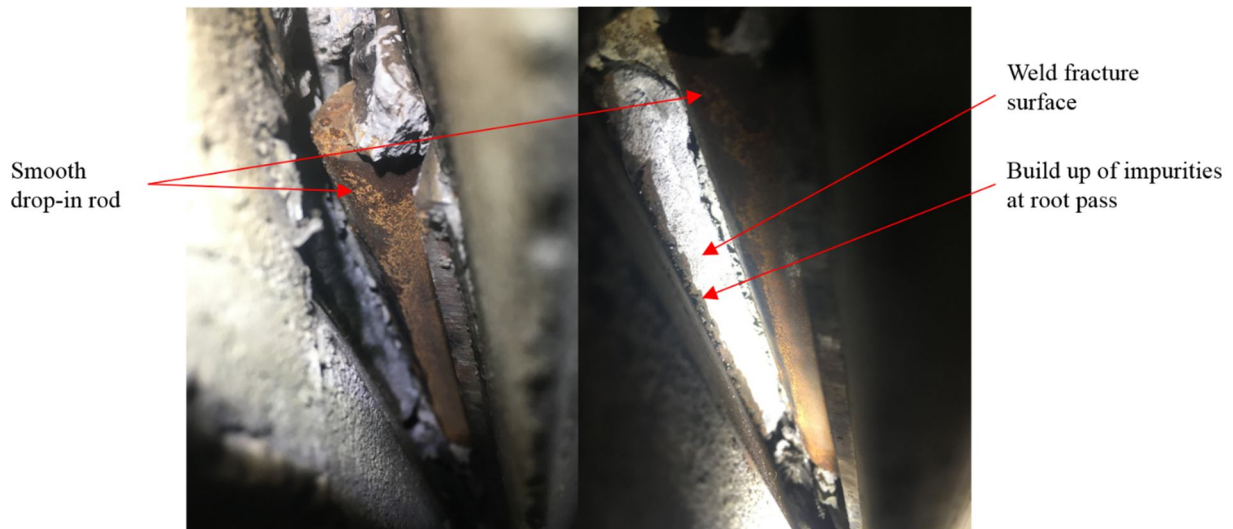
Welded connection failure test day 2 - weld failure at 194 kips
